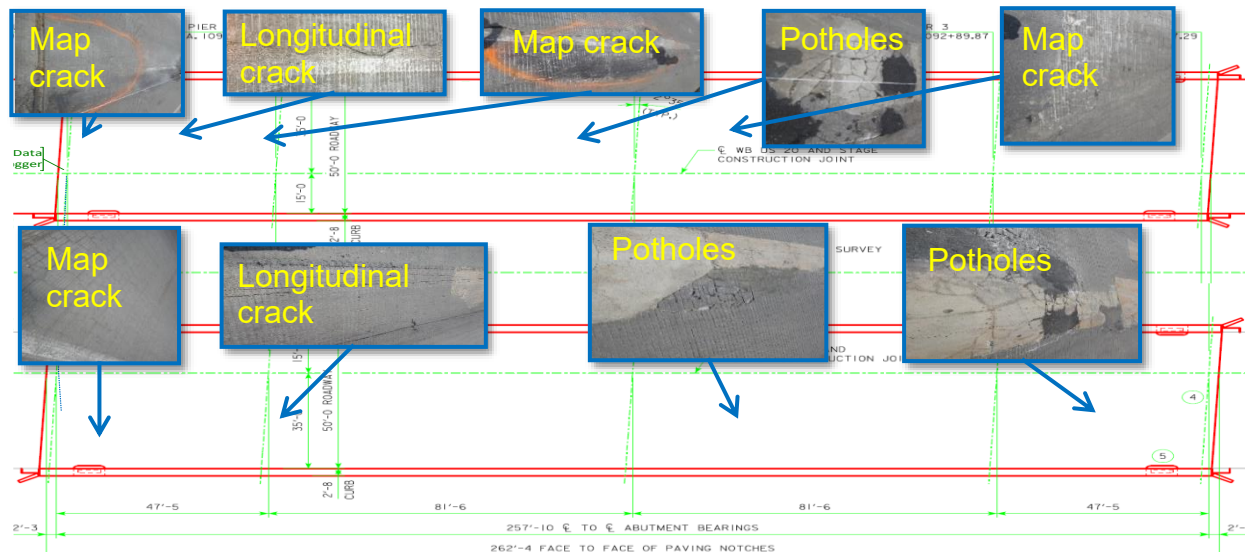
Crack survey results on the Stage 1 deck surface before new overlay construction
